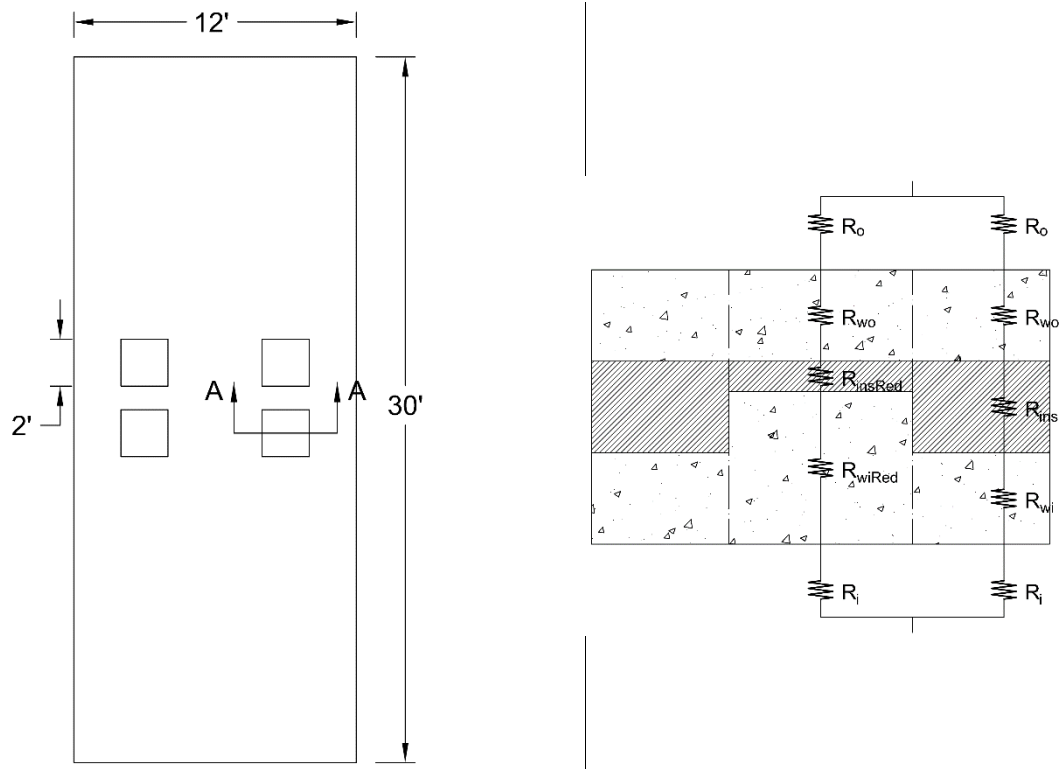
Floor with reduced insulation example panel layout and cross-section with electrical circuit analogy
